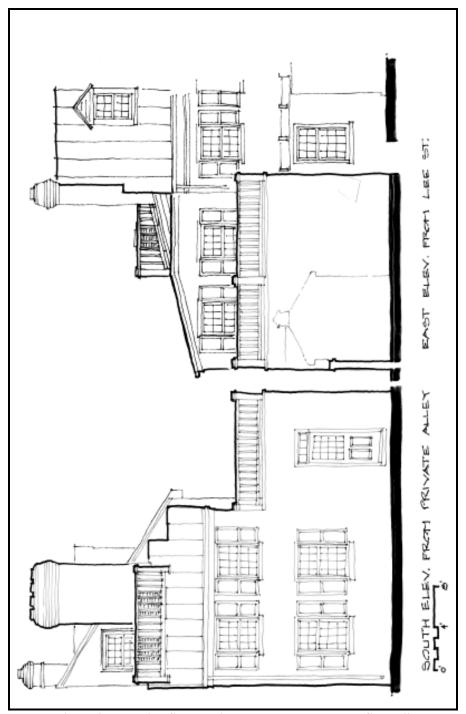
Elevation Sketch with proposed balustrade "Screen"
